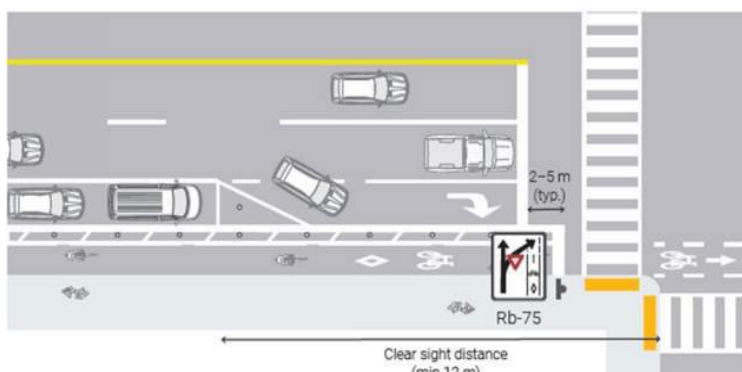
| Components of a possible adjacent crossing intersection [Source: OTM Book 18]
